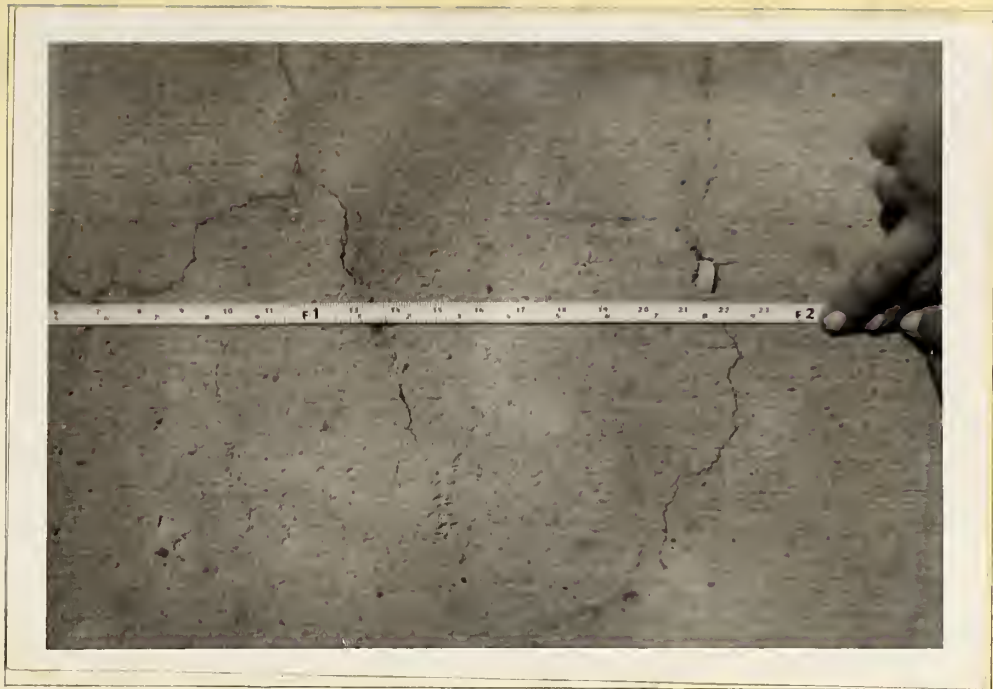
CLOSE UP OF TYPICAL SHRINKAGE CRACKS
